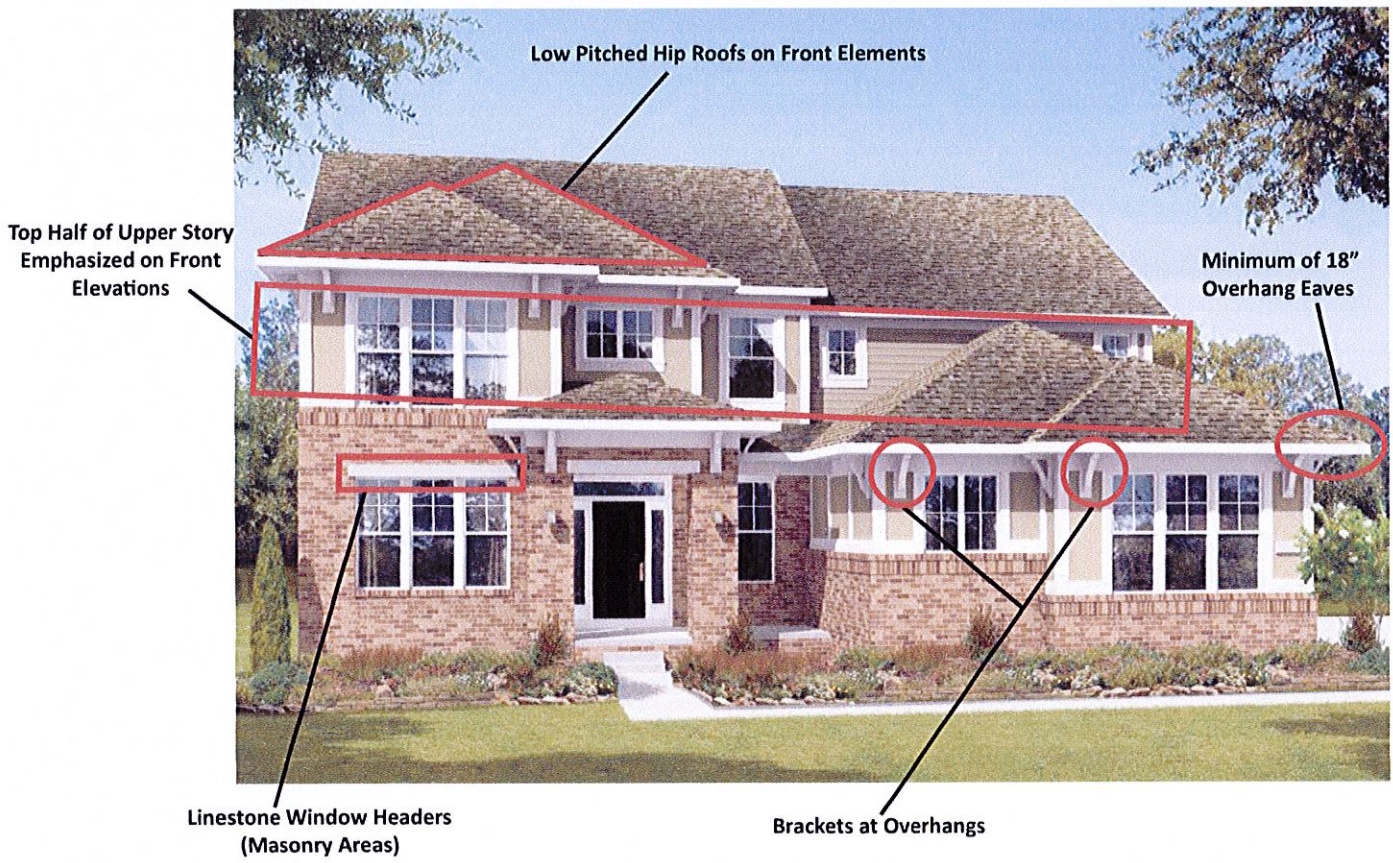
EXHIBIT D - ARCHITECTURAL STYLES GALLERY
